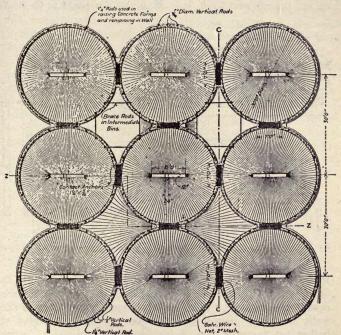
Plan of Canadian Pacific Grain Elevator, Port Arthur, Ontario.
